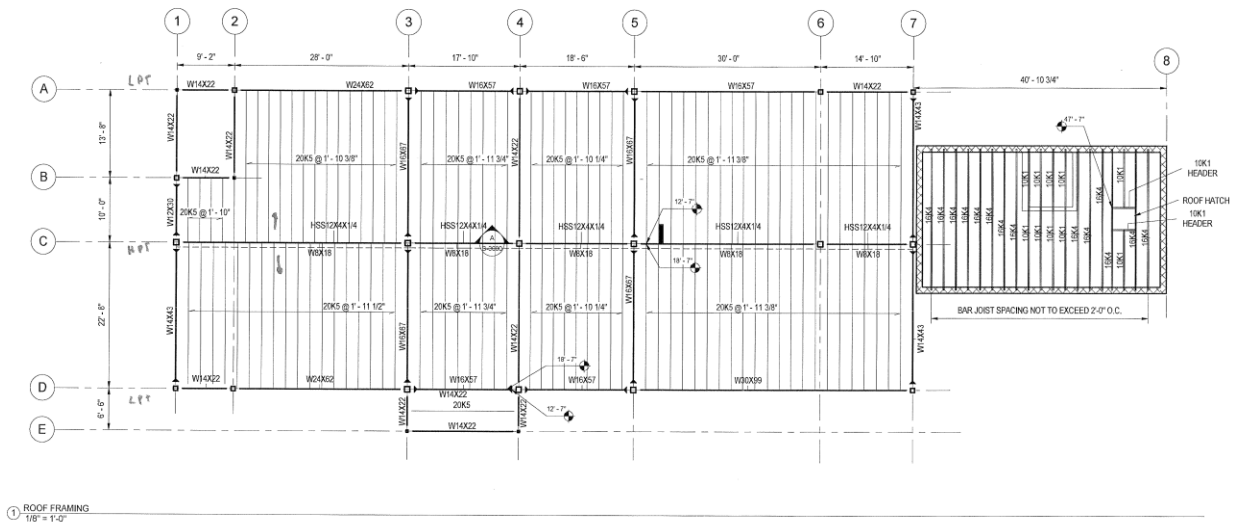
Building Floor Plan used in the development of Structural Assignment Modules
